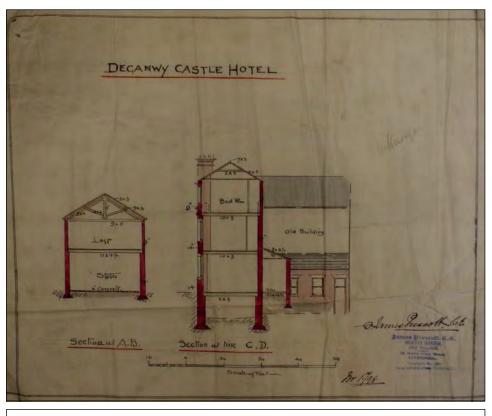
Proposed Modifications to the Deganwy Castle Hotel 1898. Source: Conwy Archives Doc C Maps & Plans 23/1/131
